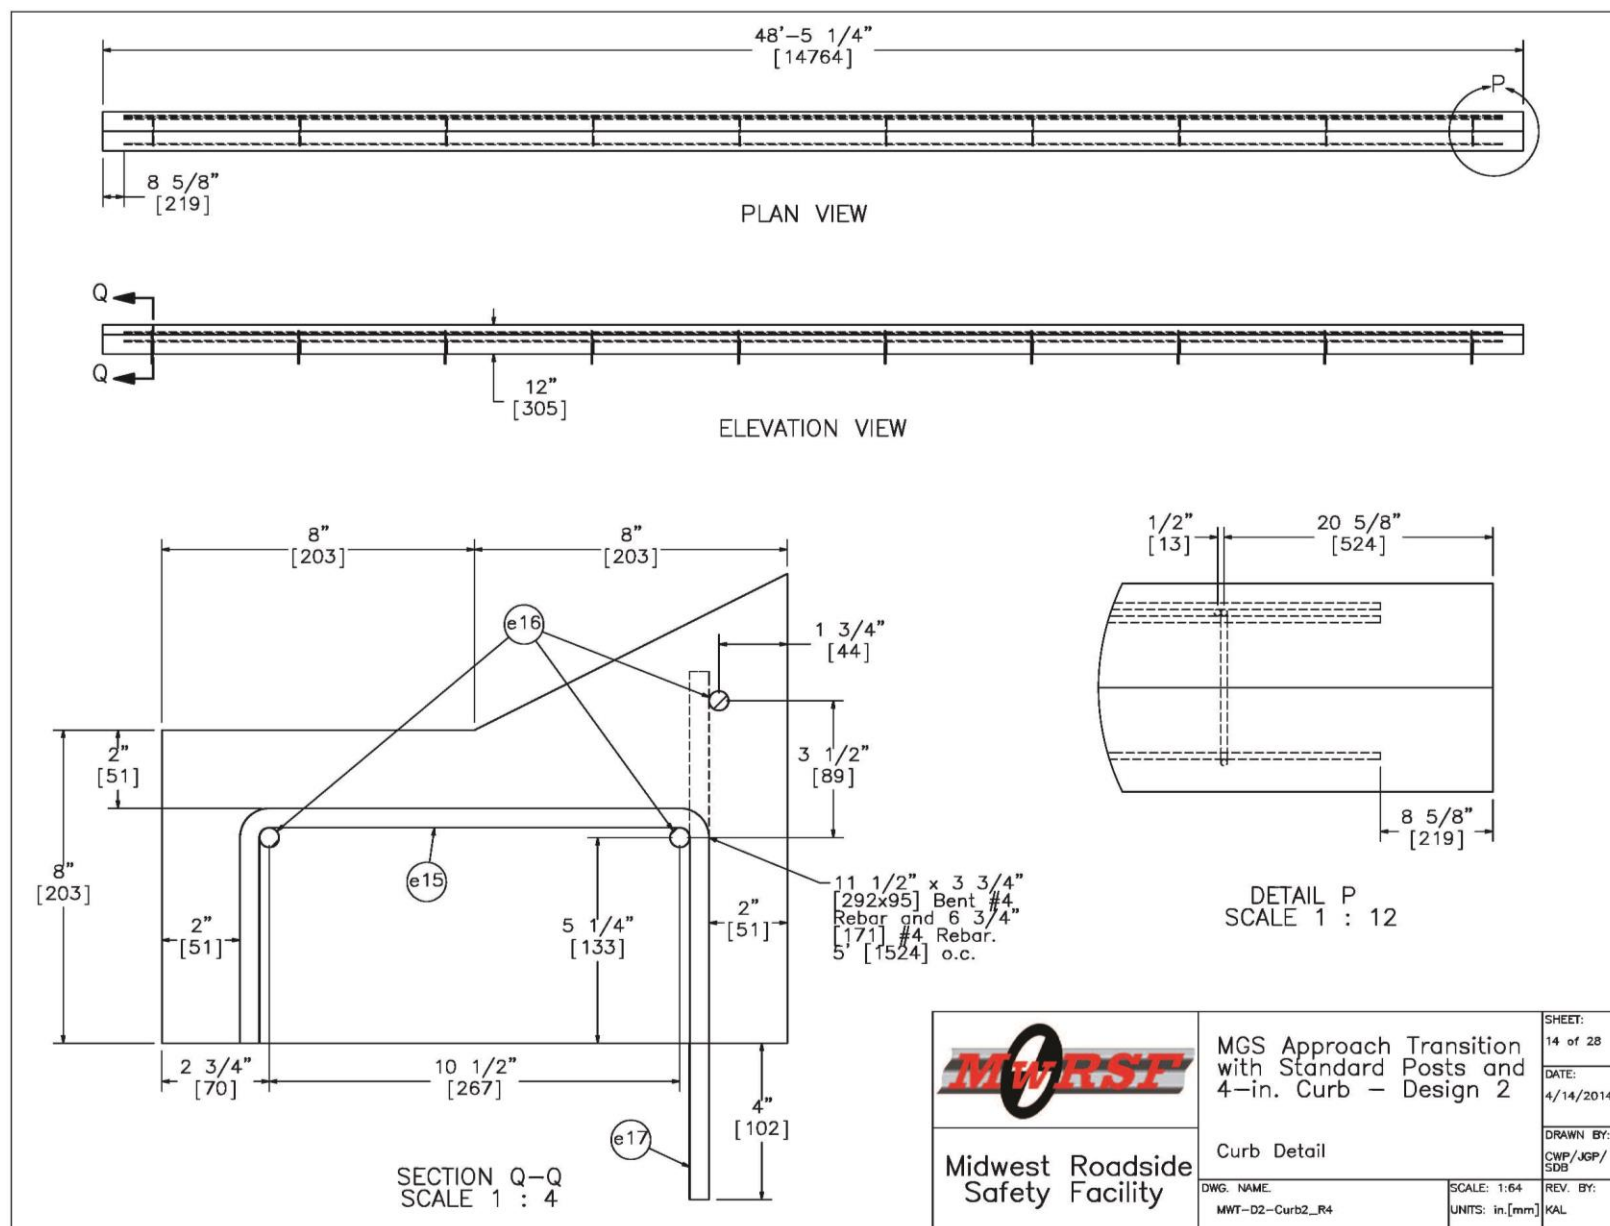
Curb Detail, Test Nos. MWTC-2 and MWTC-3
